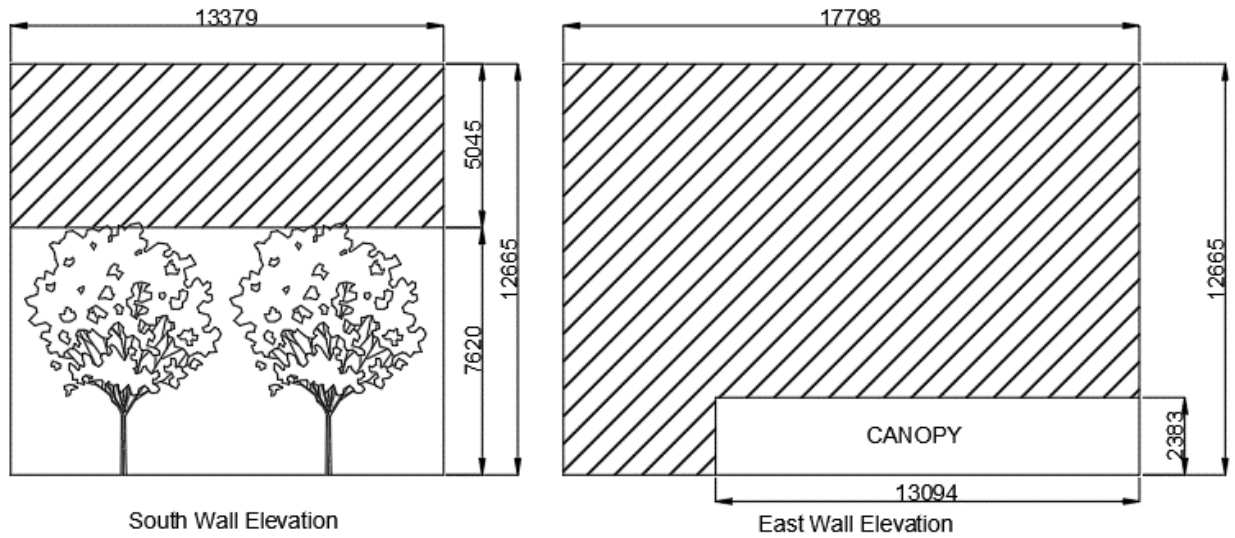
Elevation drawings of the east and south walls showing shaded area provided by design layout 1.
